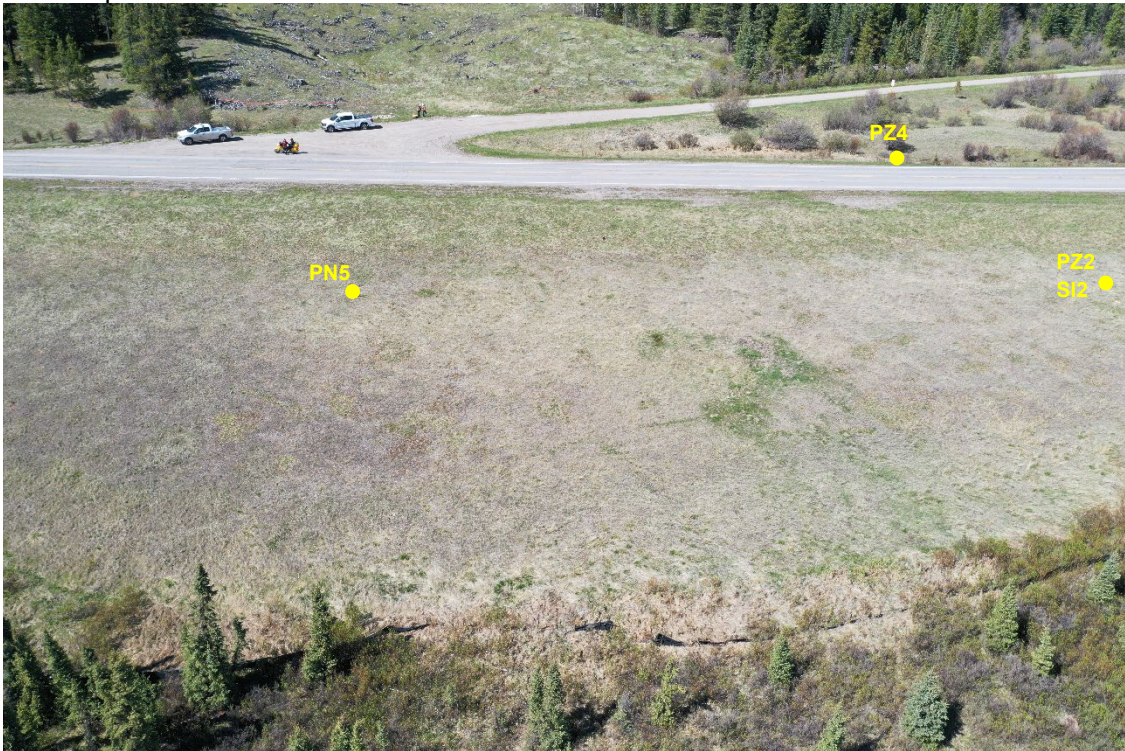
Overview of embankment slope. Photo taken by drone, looking north.
